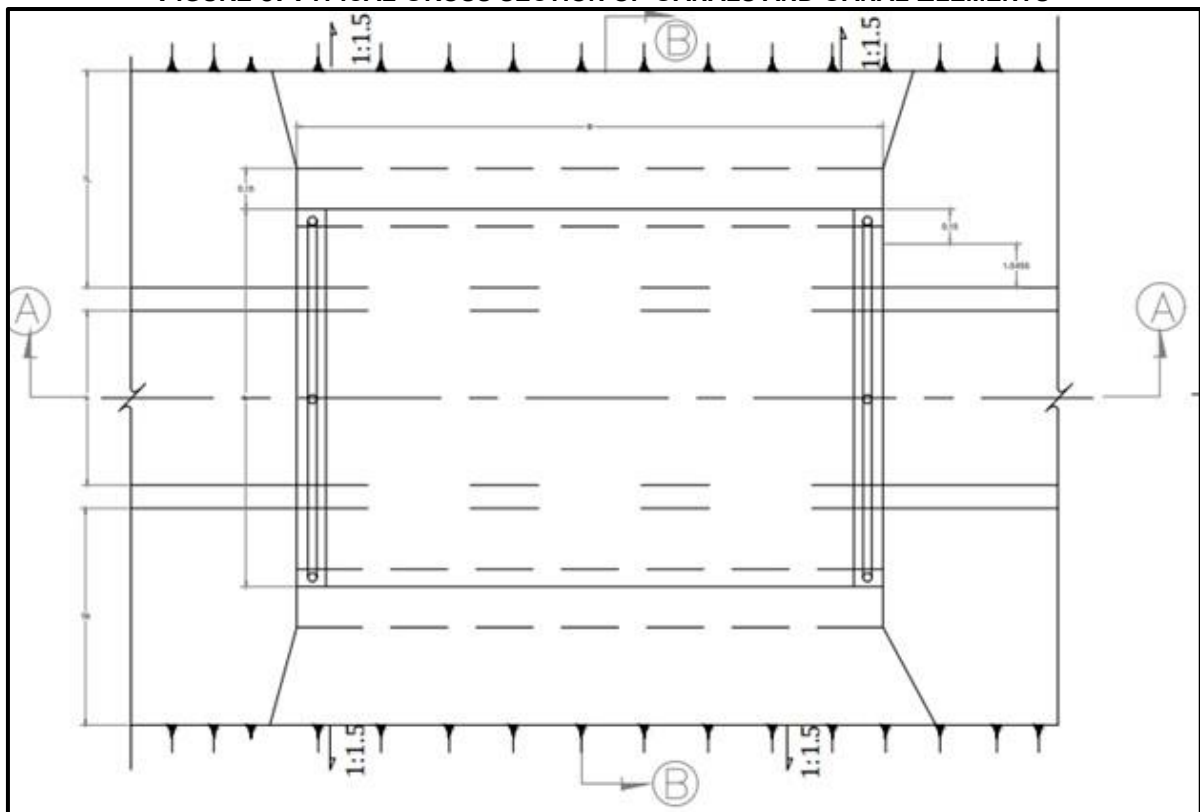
TYPICAL CROSS SECTION OF CANALS AND CANAL ELEMENTS
